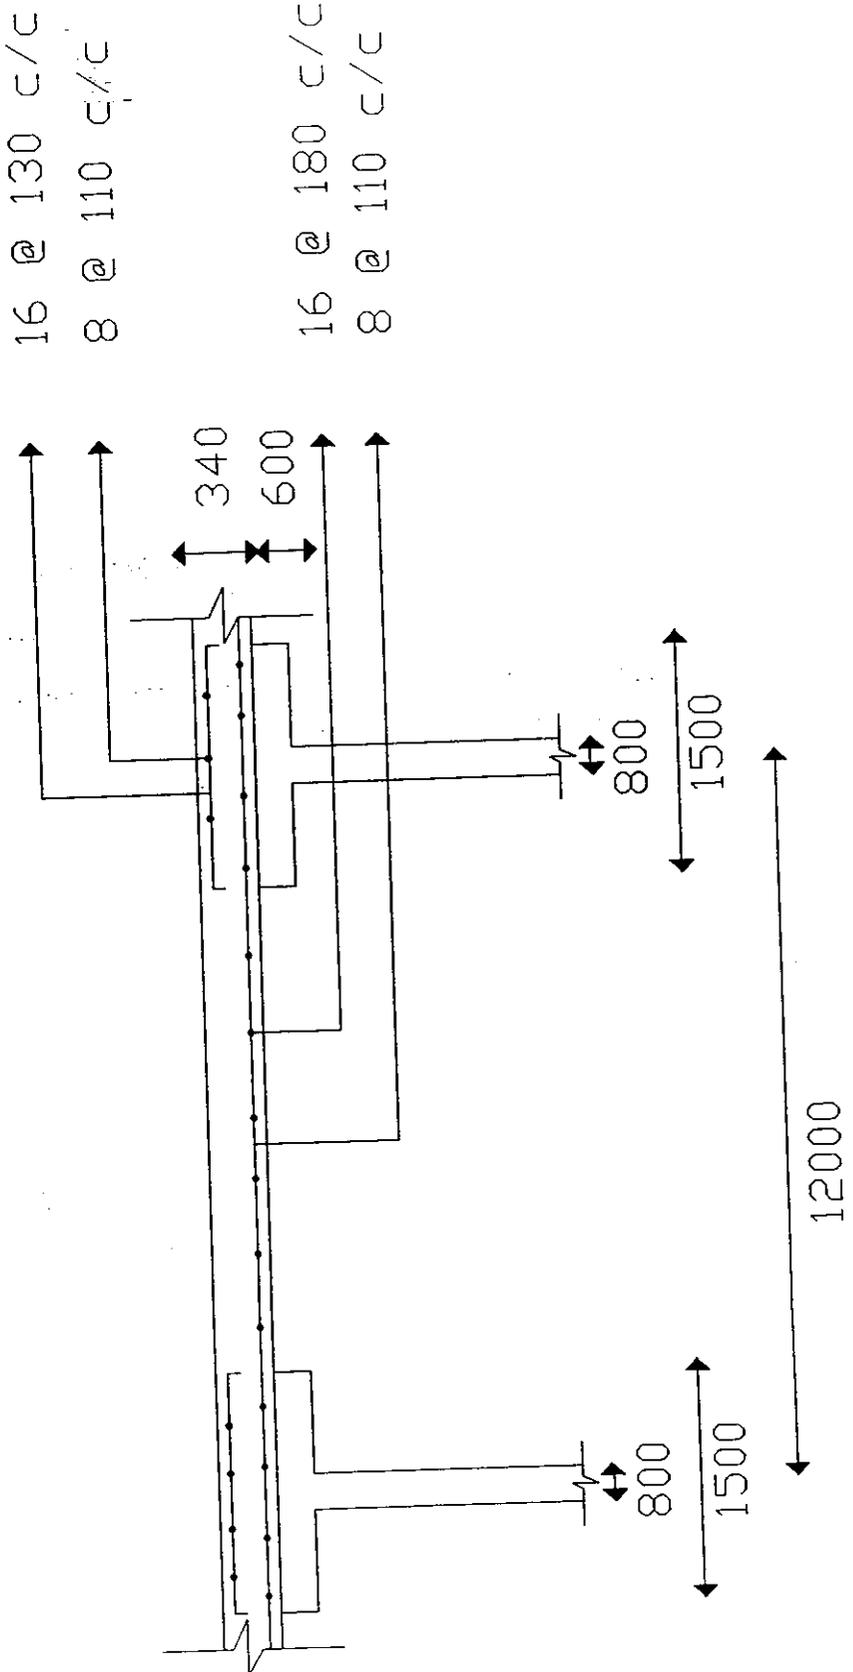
COLUMN REINFORCEMENT OF FLAT SLAB
